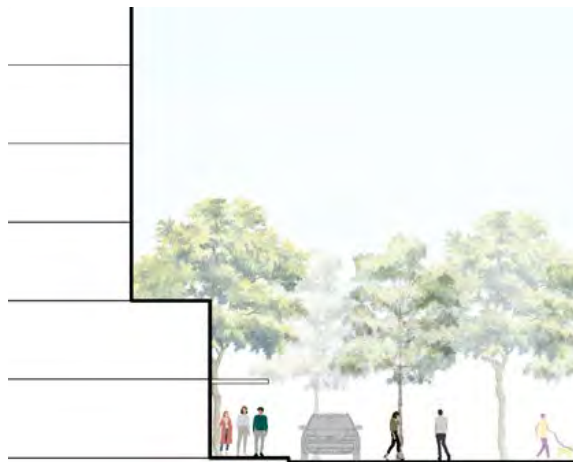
Building 1C lobby entrance from Elizabeth Lane (Section 3)
